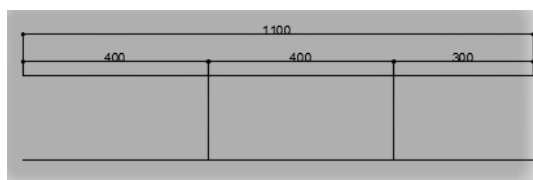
Cross-Section of unreinforced masonry specimen
